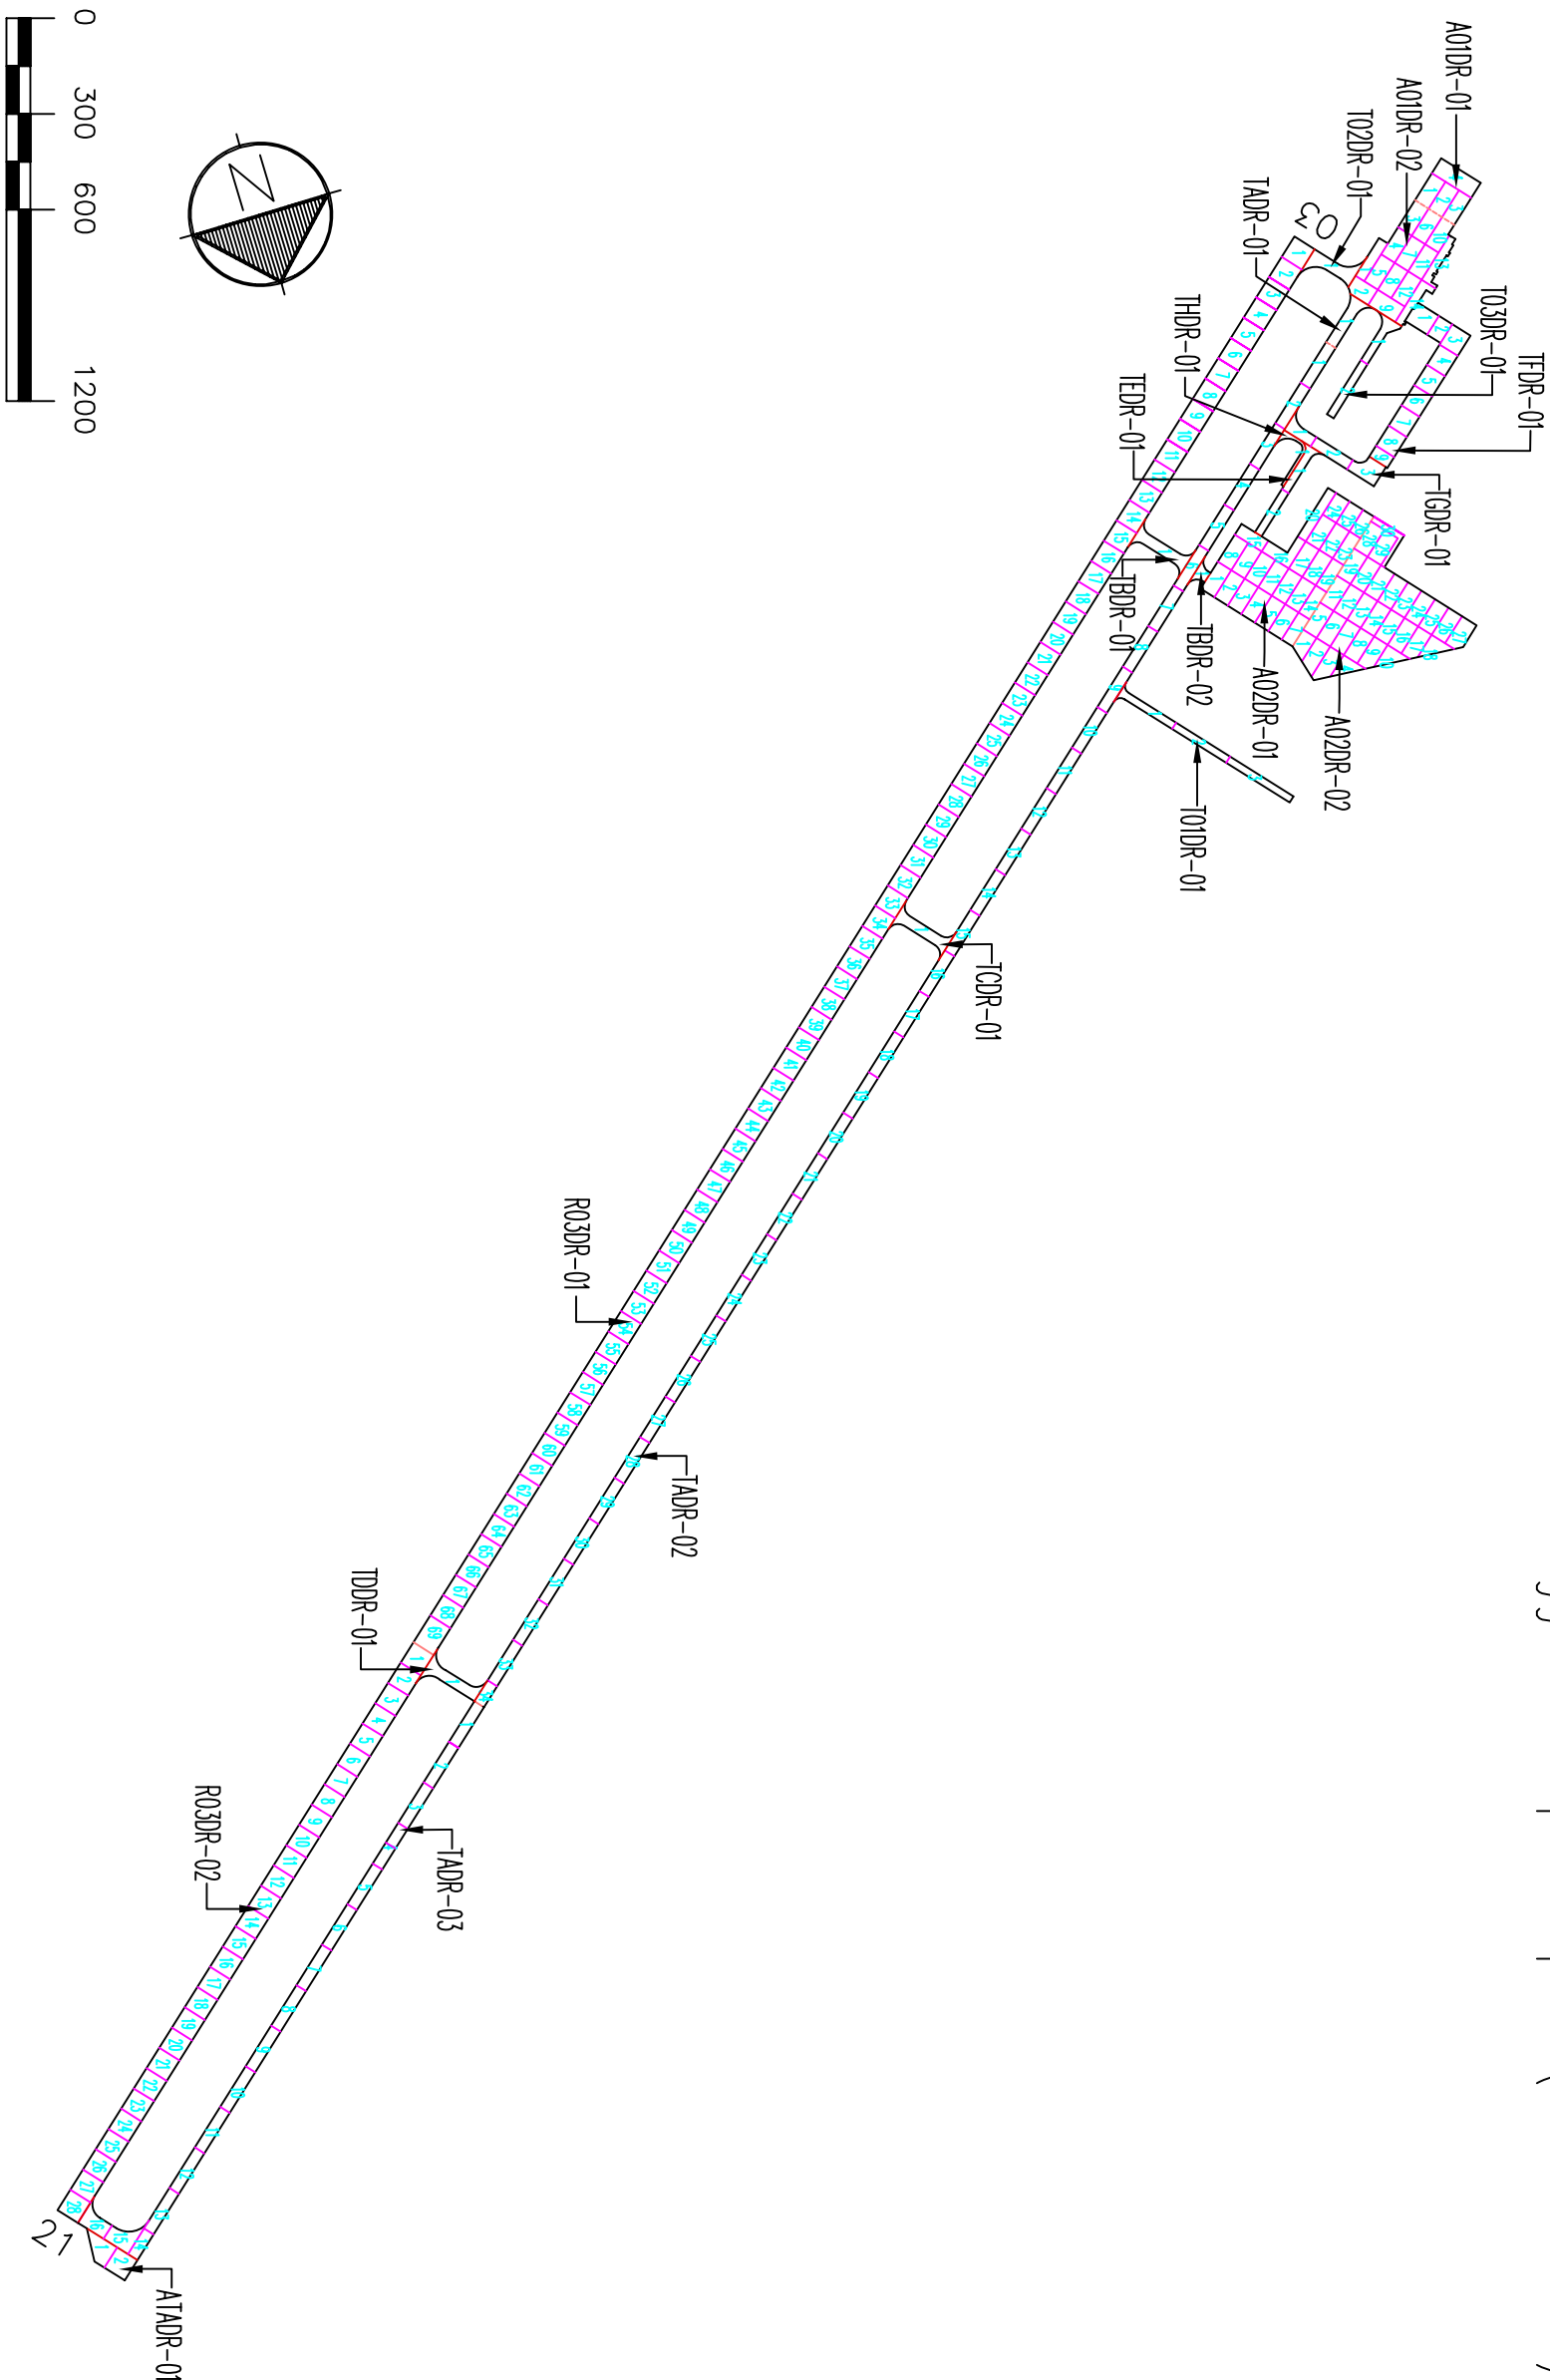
Pavement Branch, Section and Sample Unit Layout.
